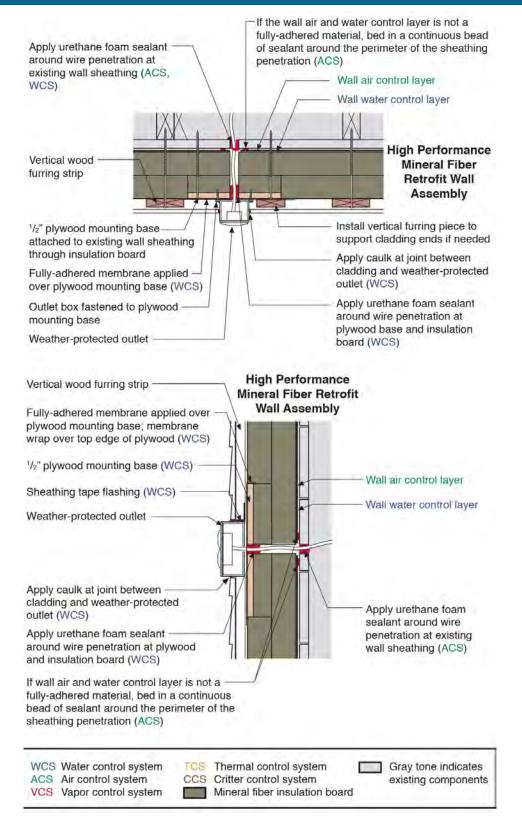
Schematic plan and section details for wire penetration and exterior outlet box mount in a high performance mineral fiber retrofit wall assembly
